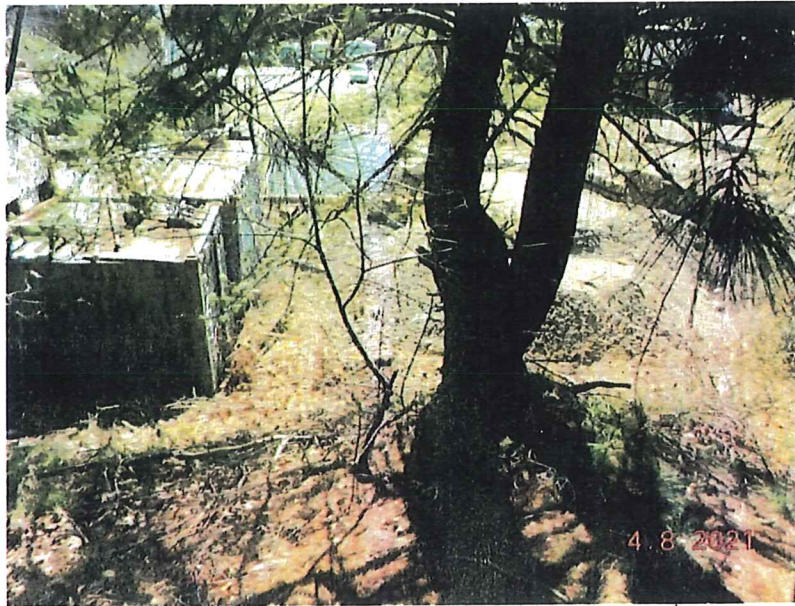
Photo from Northeast Corner of 217 Cocasset looking east towards 227 Cocasset. Common property line is off the right side of the photo. Note stockpiles, concrete block containment walls, gravel/disturbed surface, and lack of vegetated/landscaped buffer.
